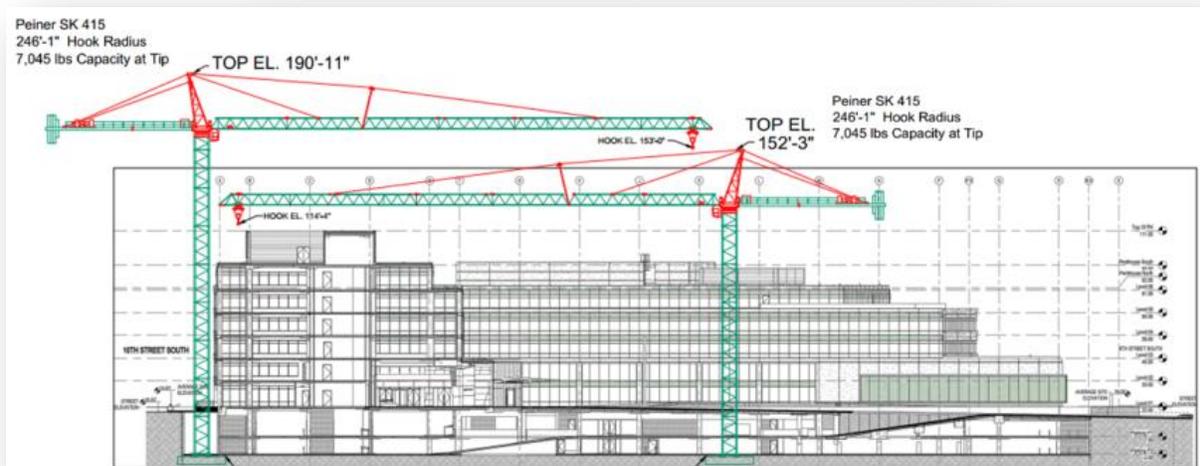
Vertical Crane Plan Courtesy of Facchina Construction Company
